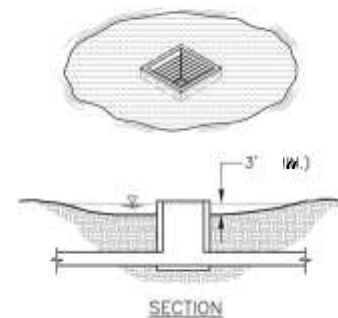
Self-retaining areas. Berm or depress the grade to retain at least an inch of rainfall and set inlets of any area drains at least 3 inches above low point to allow ponding.
